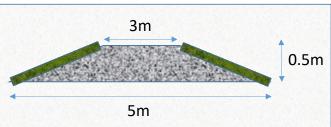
Schematic Profile and Cross-Section of Elevated Path
